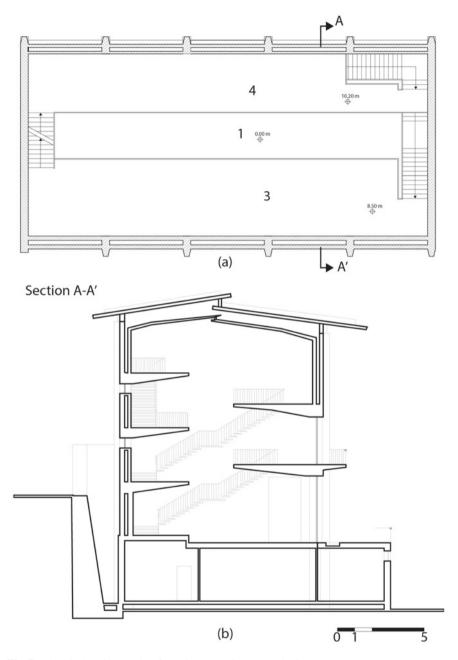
The 1955 project: a plan; b section (Drawing: A. Meloni)
